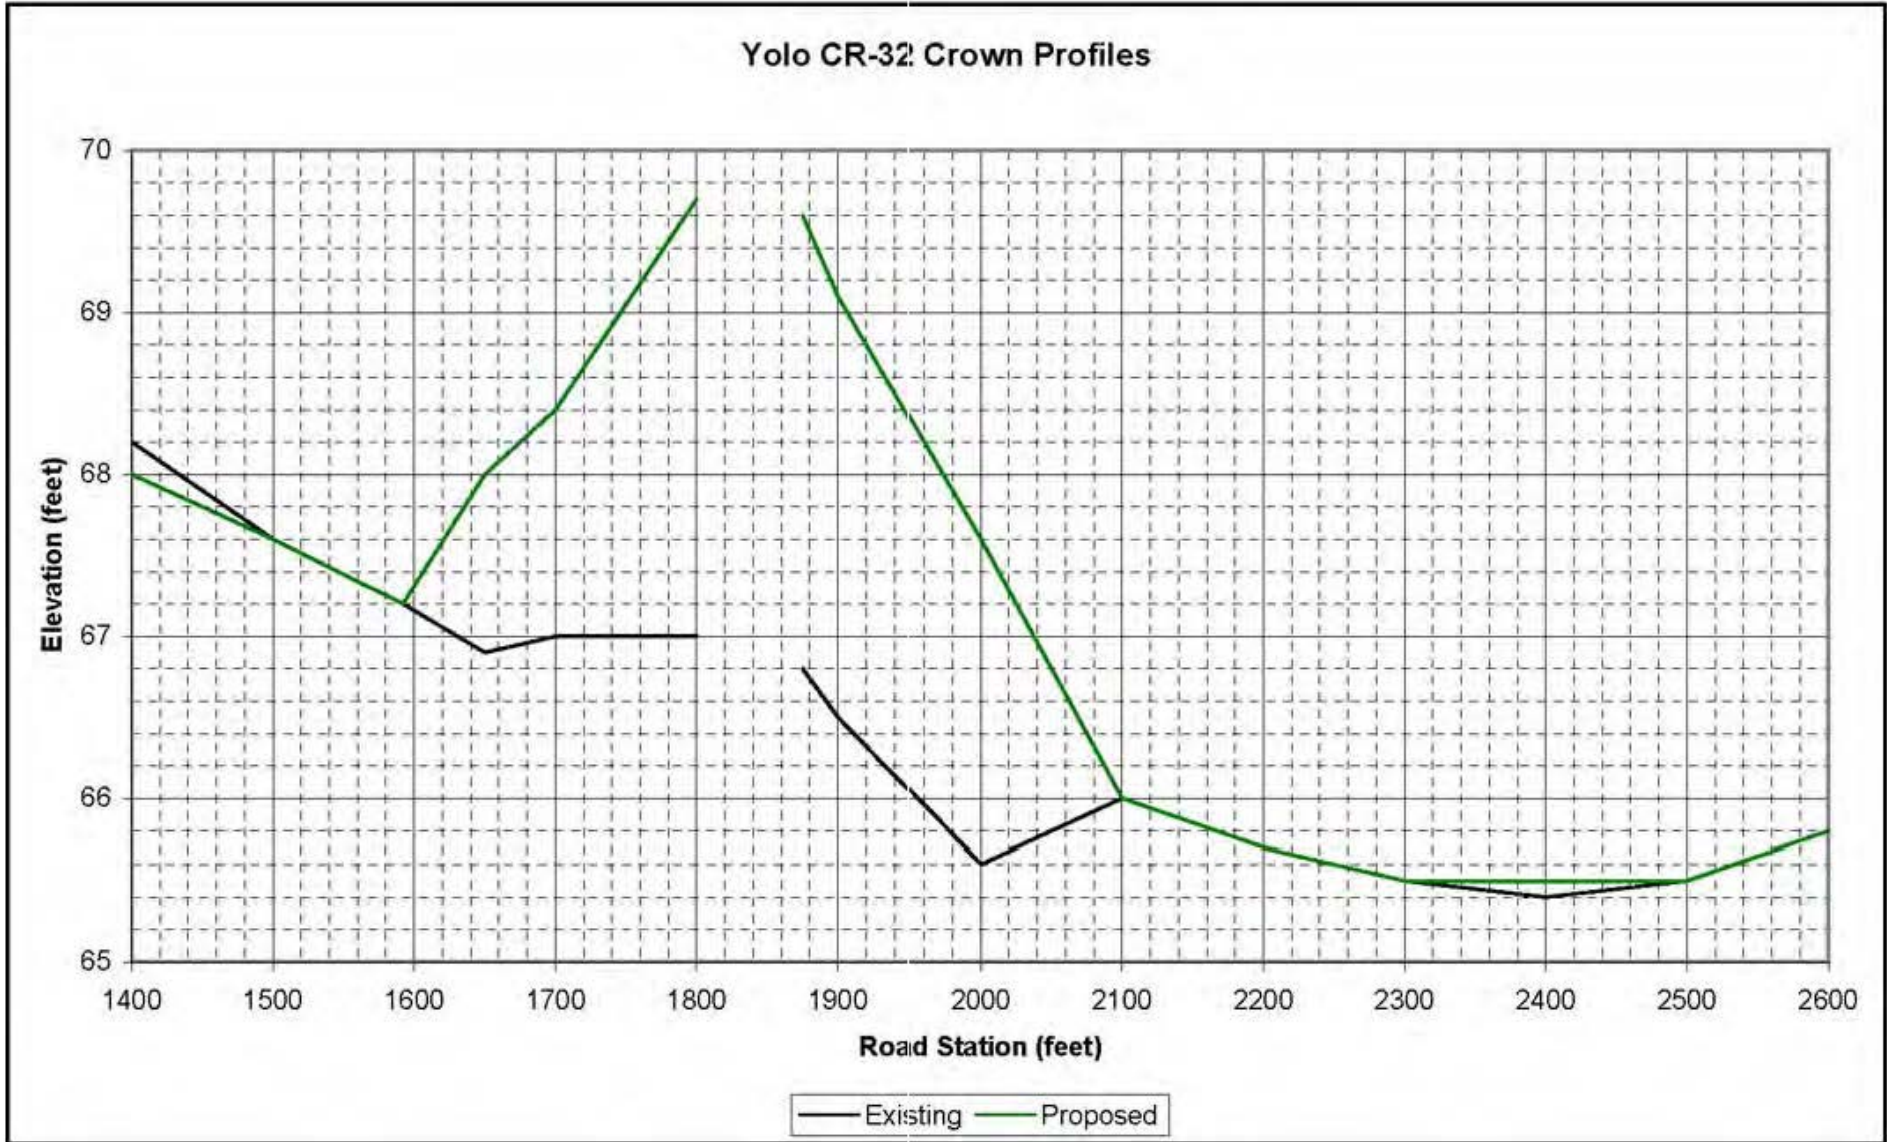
Existing and Proposed Condition Road Crown Profiles, County Road 32
